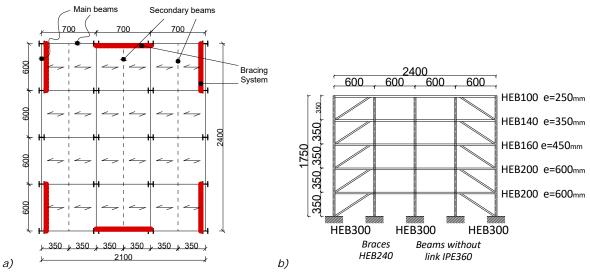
General plan of EBF steel building a) 5 storey buildings (3 and 4 in [2]), b) scheme of elevation.
